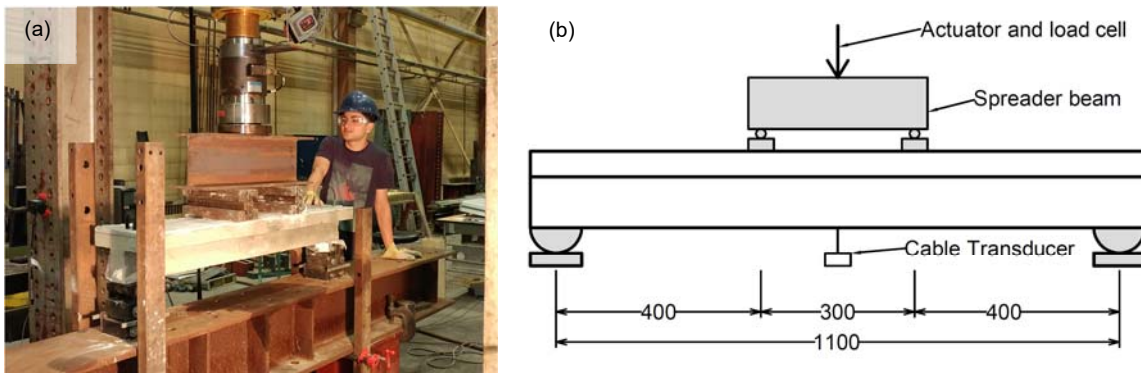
Test setup and instrumentation (a) photo of beam immediately before testing (b) diagram showing load points and instrumentation. All dimensions in mm.
